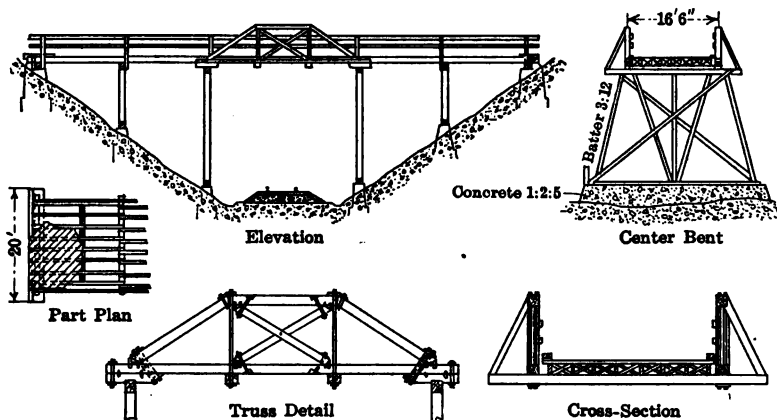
Carolina, Clinchfield & Ohio Ry., Standard Wooden Highway Bridge Crossing
